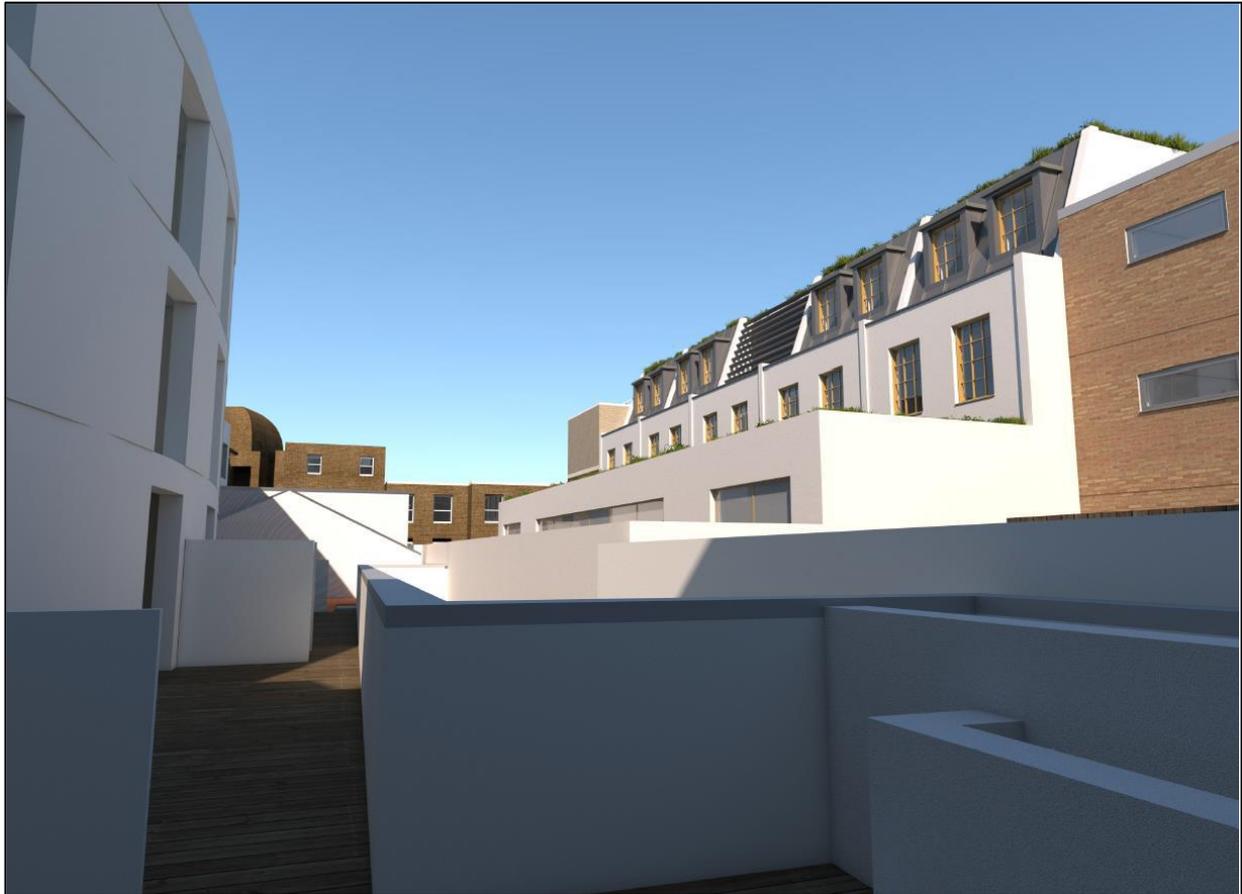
Proposed CGI of the rear elevation as seen from the first floor roof terrace of Flat 5 at Pietra Lara Building.
